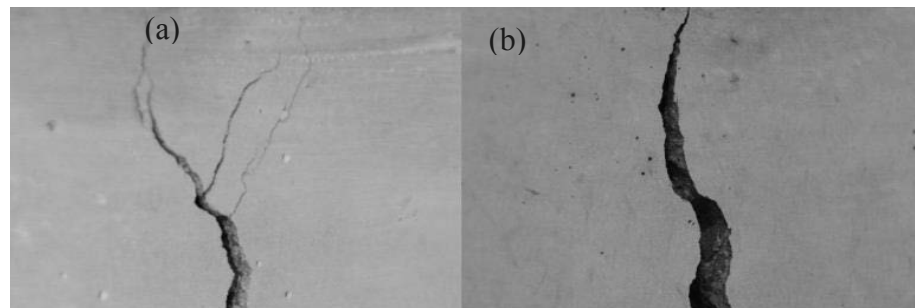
Crack propagation in concrete samples (a) gradual crack propagation and no sharp tip of crack of rubberised concrete sample with 30% rubber content, (b) typical cracking propagation pattern of plain concrete samples with a sharp crack tip
